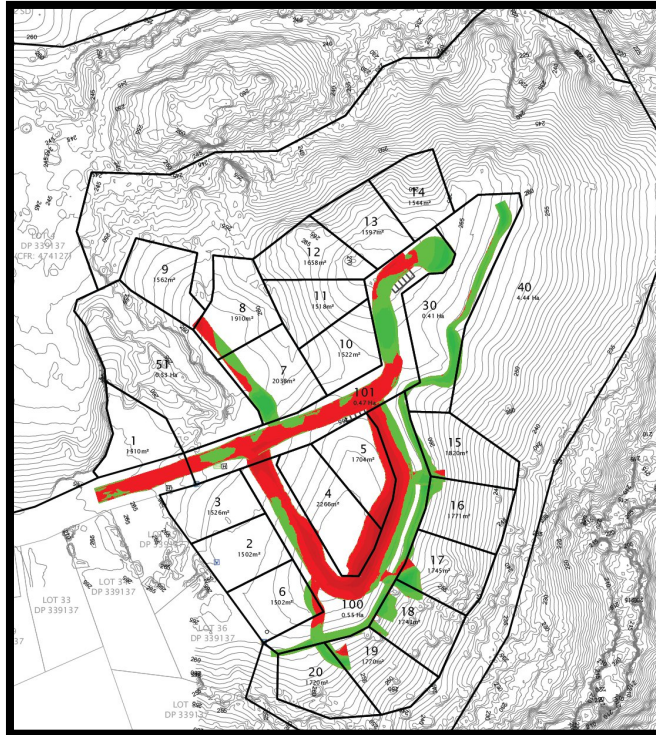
Earthworks Plan – Red = Cut Green = Fill (Source: Application)
